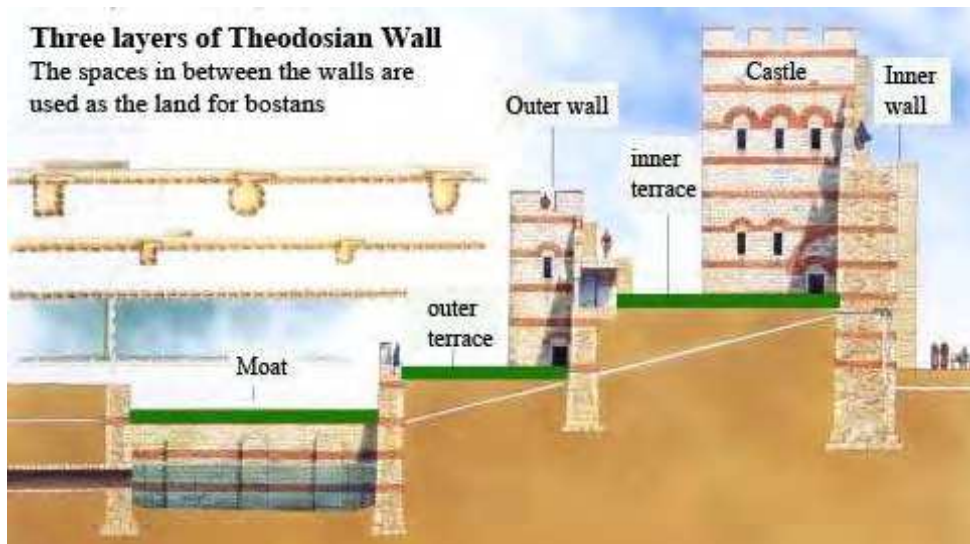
The cross-section and plan of Land Walls, the spaces in between the land walls, which are named moat, outer terrace and inner terrace, are used as land for bostans, colored by author. (Source: after Turnbull, S. 2004, *The Walls of Constantinople AD 324-1453*, Osprey Publishing Ltd., p.11, accessed on December 12, 2014.)
